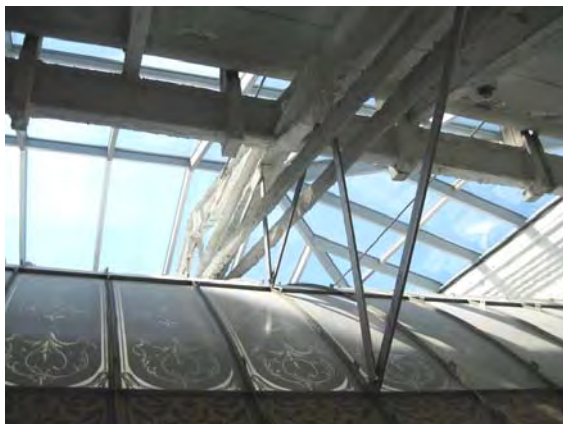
Wrought iron trusses framing the opening about the large barrel vaulted laylight in the west wing above the grand staircase.
